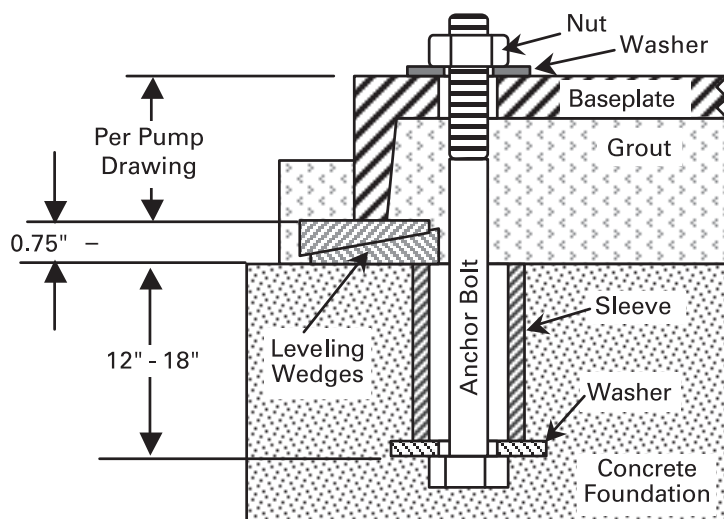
FIGURE A – TYPICAL ANCHOR BOLT (SLEEVE TYPE)
